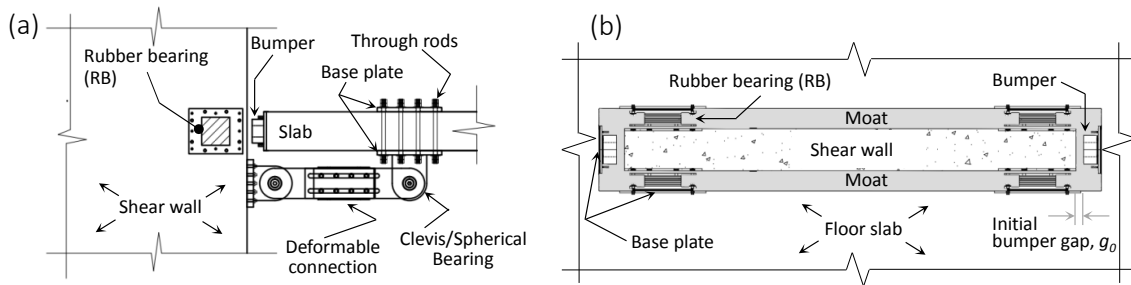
IFAS Prototype System: (a) elevation view; (b) plan view.
